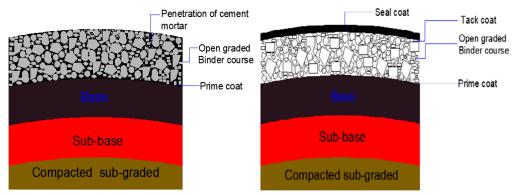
Comparison of conventional flexible pavement and modified flexible pavement with cement mortar.
